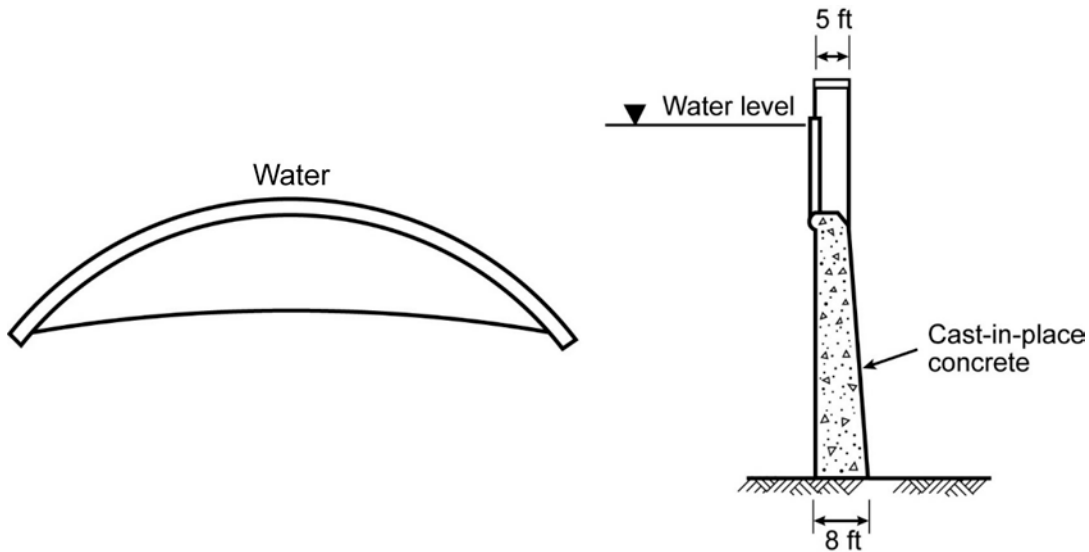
Schematic of Typical Plan and Section of a Concrete Arch Dam (AHEC-IITR 2013)
